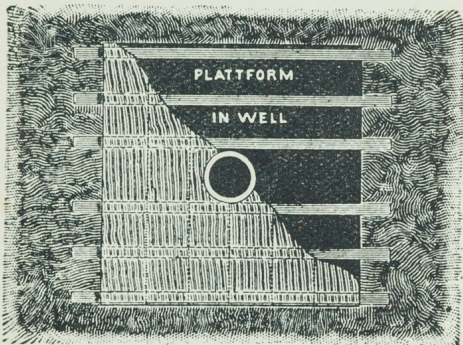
Top view of Platform below Cylinder and near the water. This Platform makes a convenient arrangement when any repair is to be made to the cylinder.
